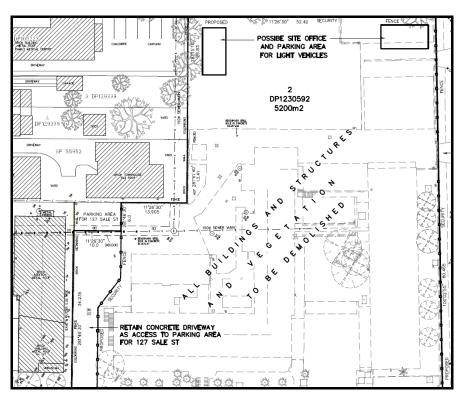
Proposed Demolition Plan (Source: Peter Basha Planning & Development)
